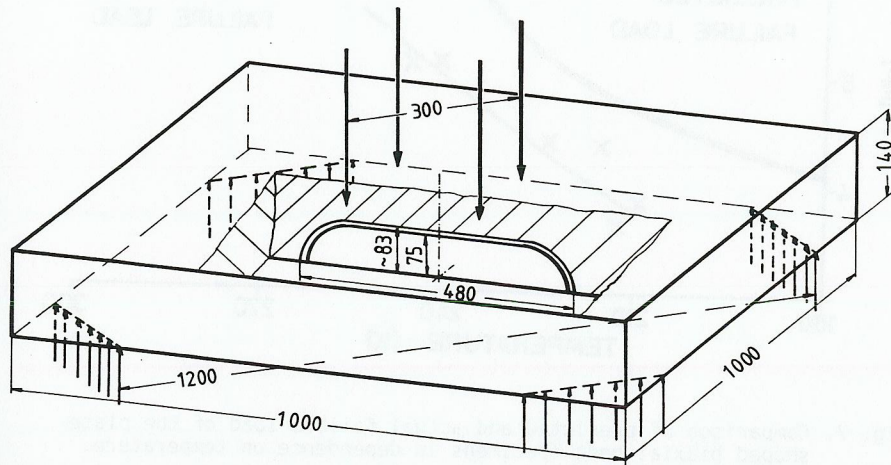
Dimensions of the plate shaped specimens and loading points for biaxial bending
